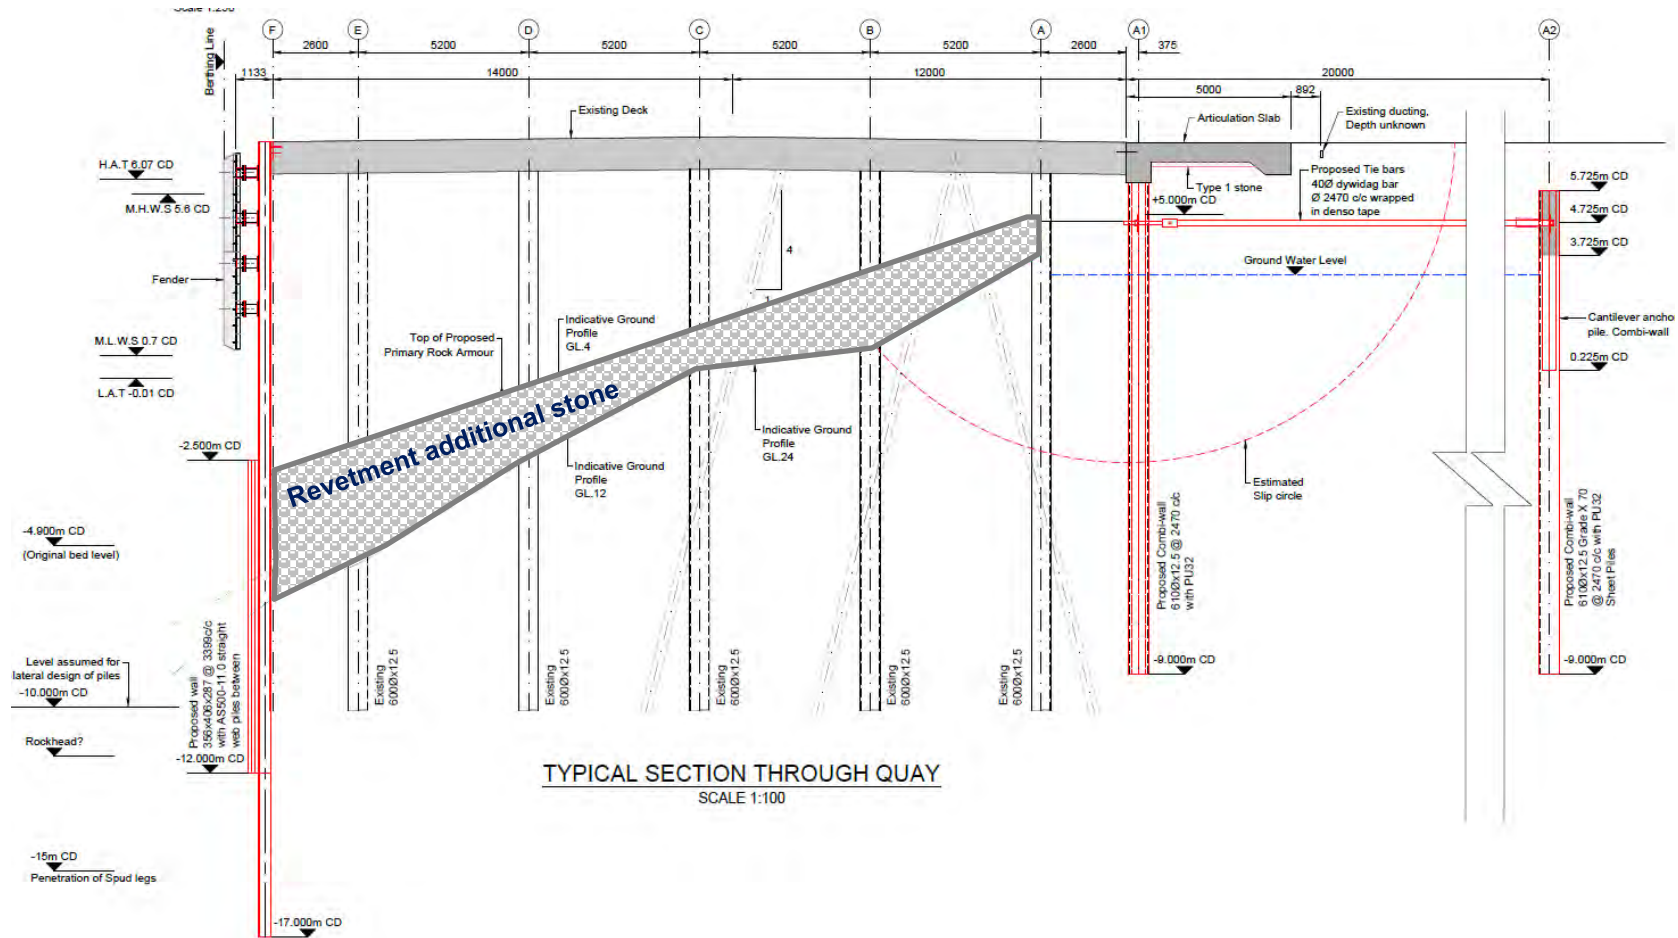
PCW improvement works (proposed new piles shown in red)
